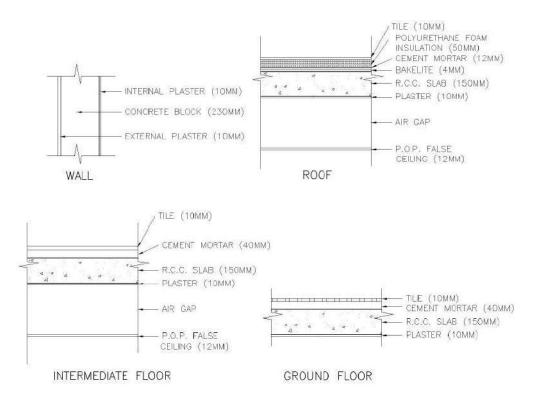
Cross section of typical wall, roof and floor of the commercial building Source – Tools for architectural design and simulation of building
